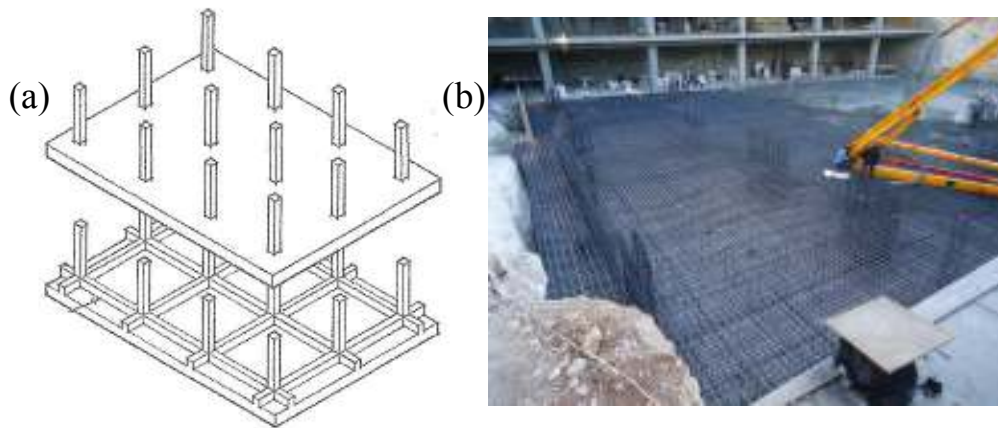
(a) Mat or Raft Foundation, (b) The foundation of Nablus tower in a form of mat
